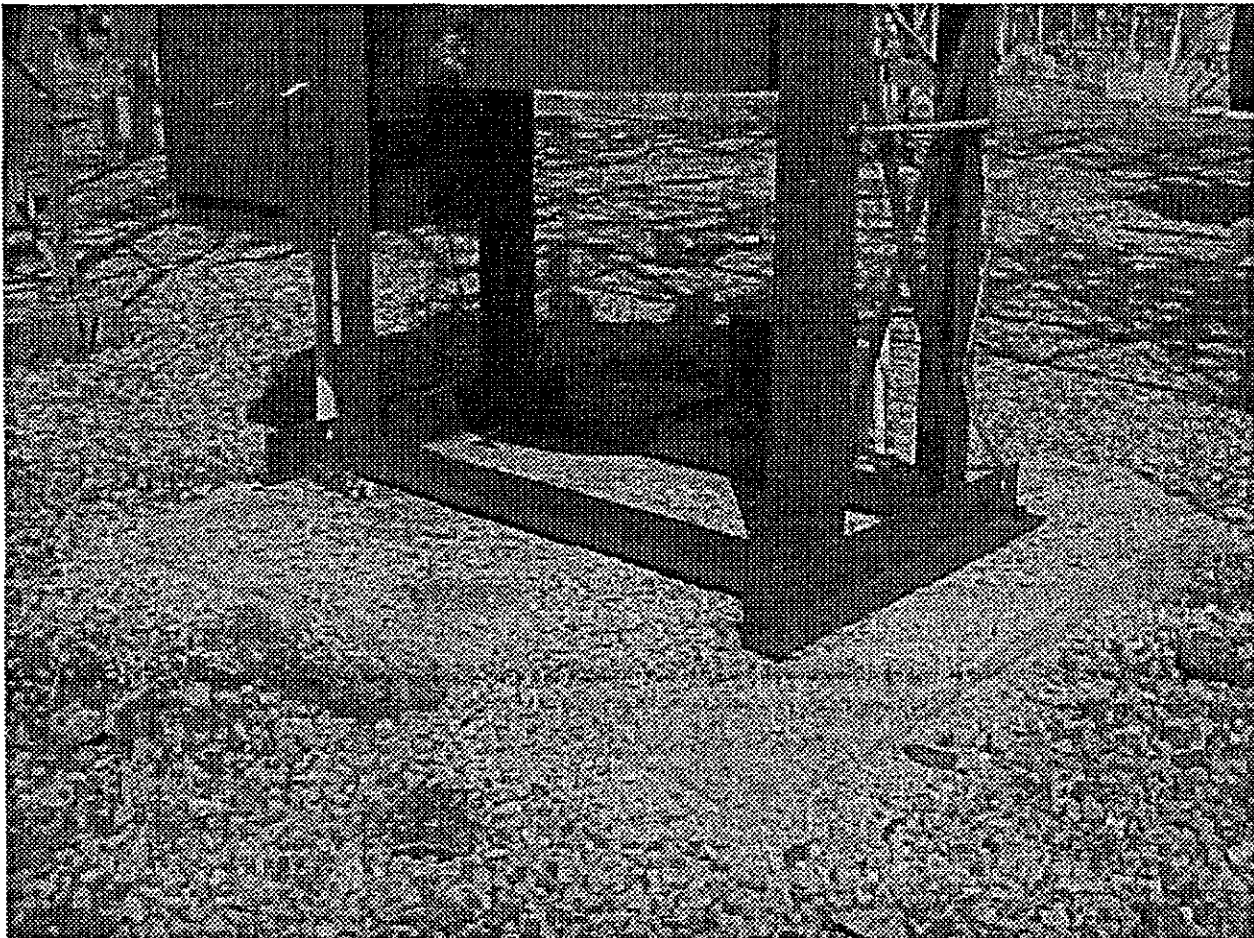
A typical concrete pad that would be a Condition 'E'.
